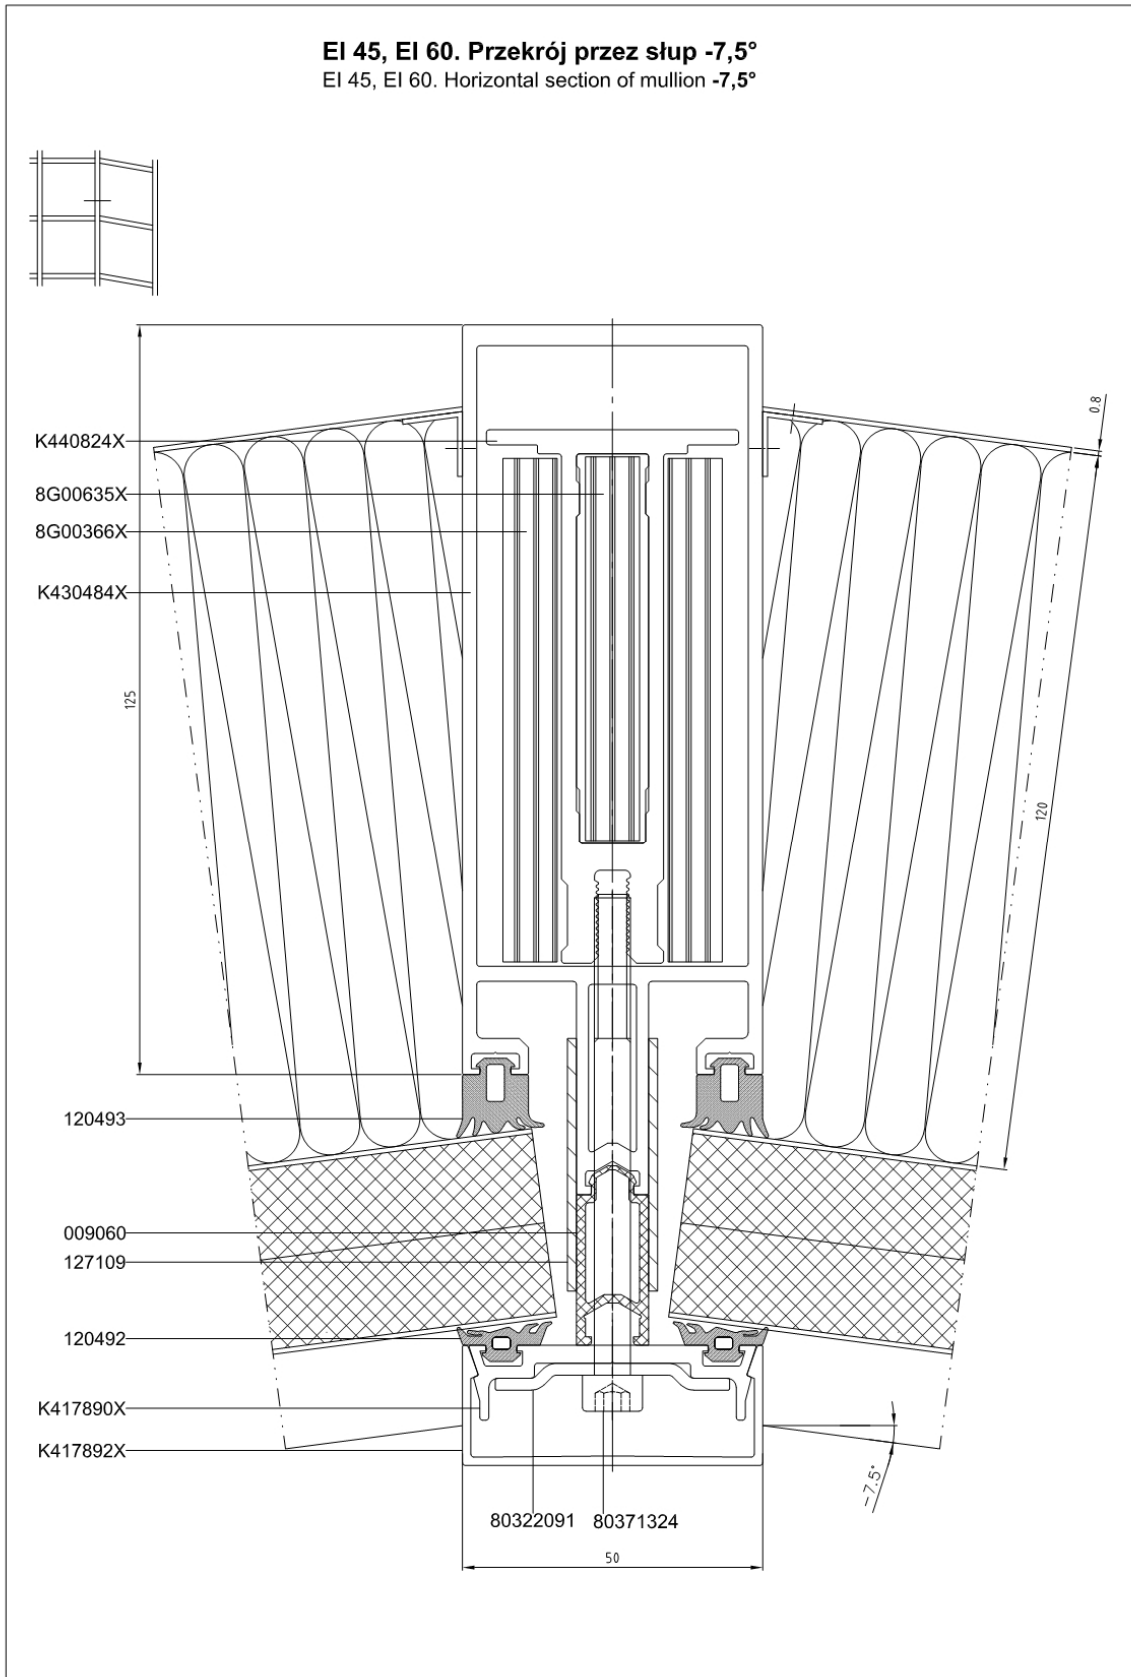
Cross-section through the typical MB-SR50N EI EI60 system mullion for small (up to 7.5 degrees) angles between adjacent curtain wall segments
